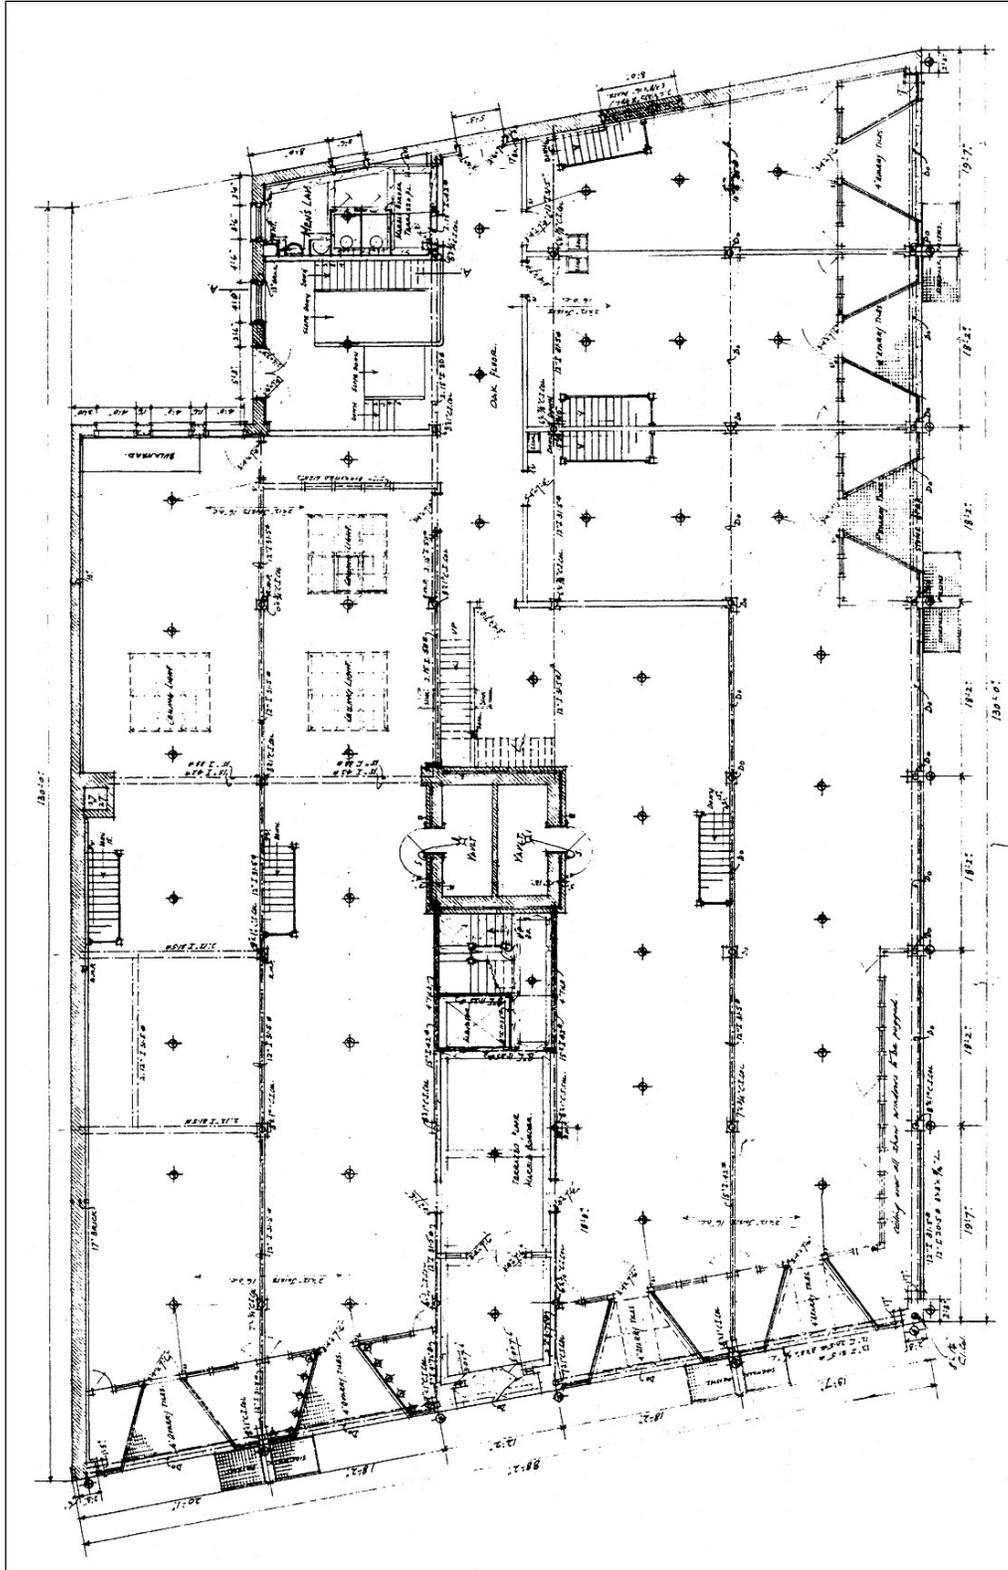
Architect’s plans, “First Floor Plan,” 1912. (Courtesy of City Archives, Plan #1399/1912.)
